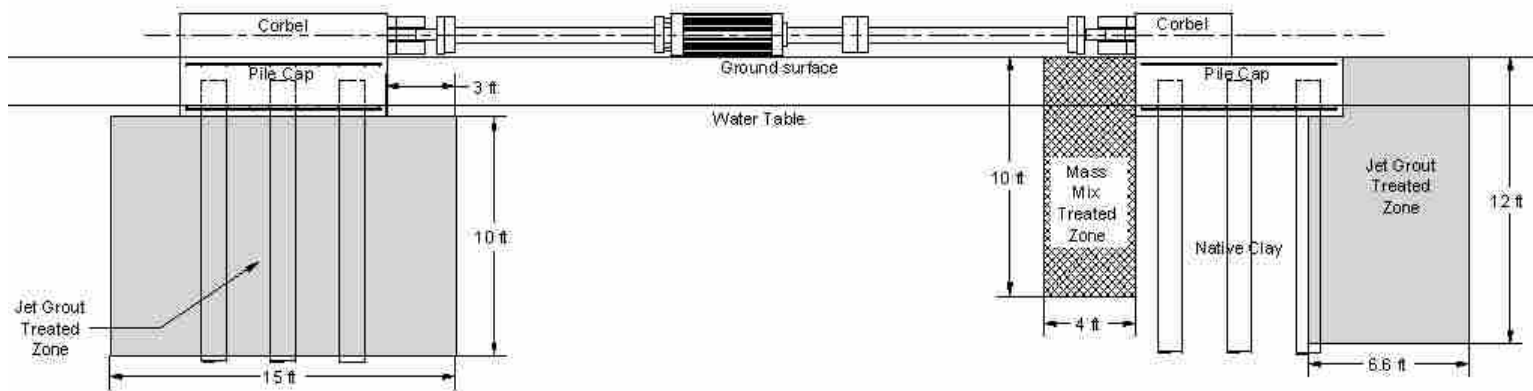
Detailed profile view of pile cap 1 (right) and pile cap 2 (left) after mass mixing and jet grouting soil improvement.
